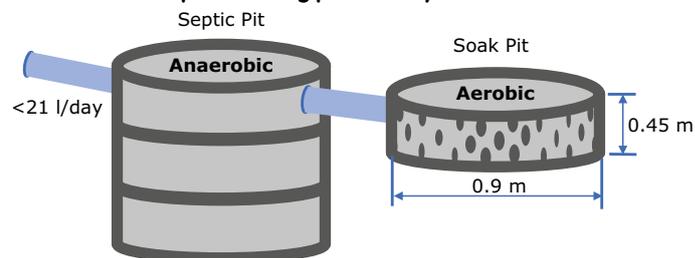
Installation of a second offset pit in very fine sandy soil in the terai where pits are filling prematurely
